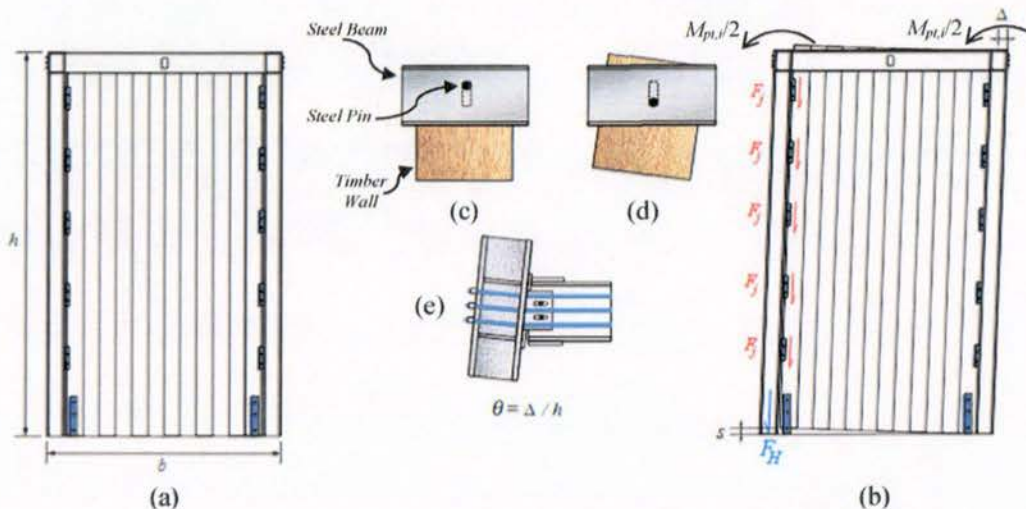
A SC-RW system with a single rocking wall: a) before rocking b) after rocking c) beam to wall connection before rocking d) beam to wall connection after rocking e) gap opening in the post-tensioned beam-column connection.
